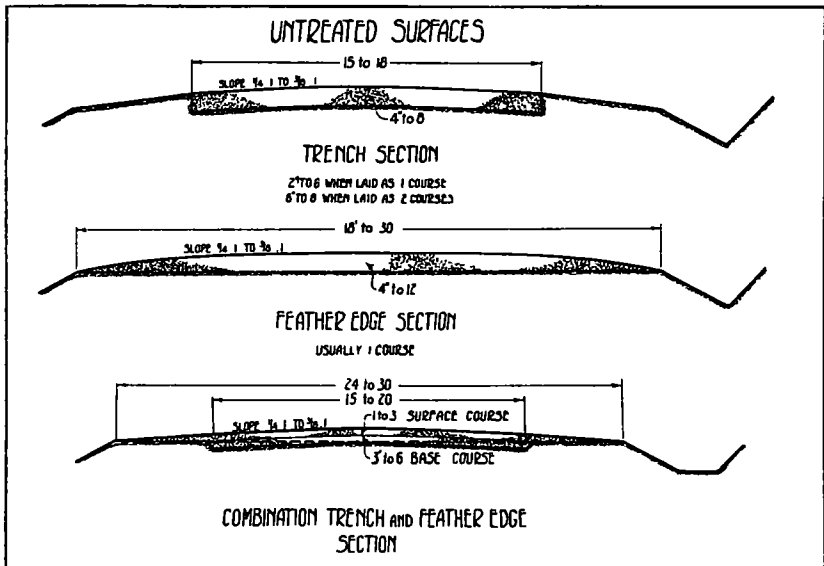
The Three Principal Cross Sections Used for Untreated Surfaces. Except for the Trench Section They Are Commonly Maintained by Blading and Dragging
